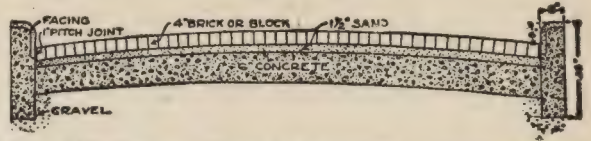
Section of Brick Pavement, Showing Method of Construction.
